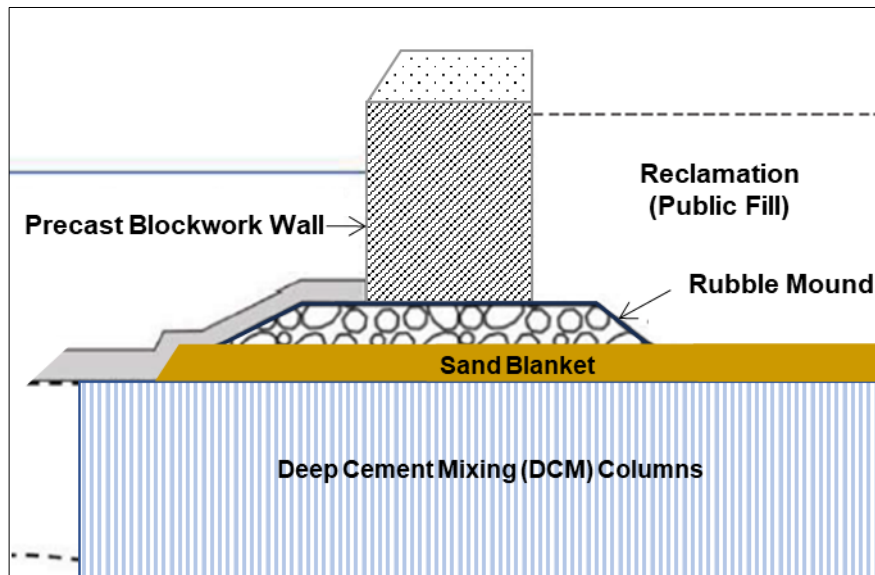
Typical Cross Section of Non-dredged Reclamation (Vertical Seawall)
